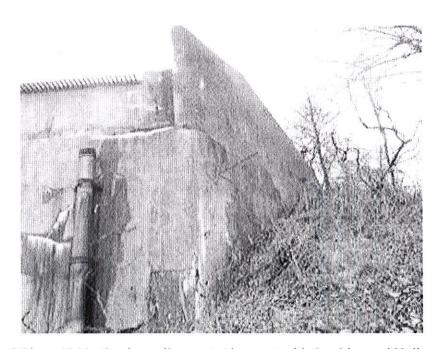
Photo 12 North wingwall at west Abutment with Cracking and Hollow Areas
